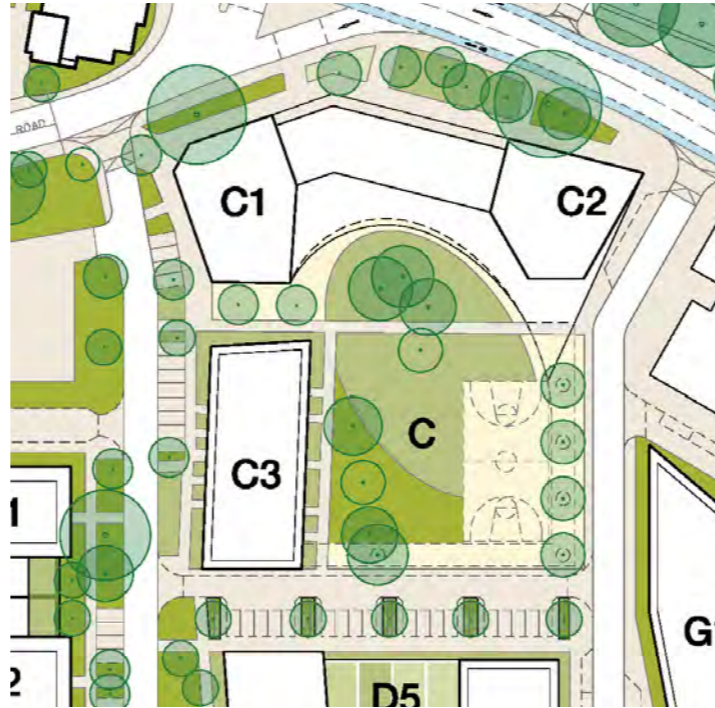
Version A: Bid Stage Ground floor plan. Plot C
